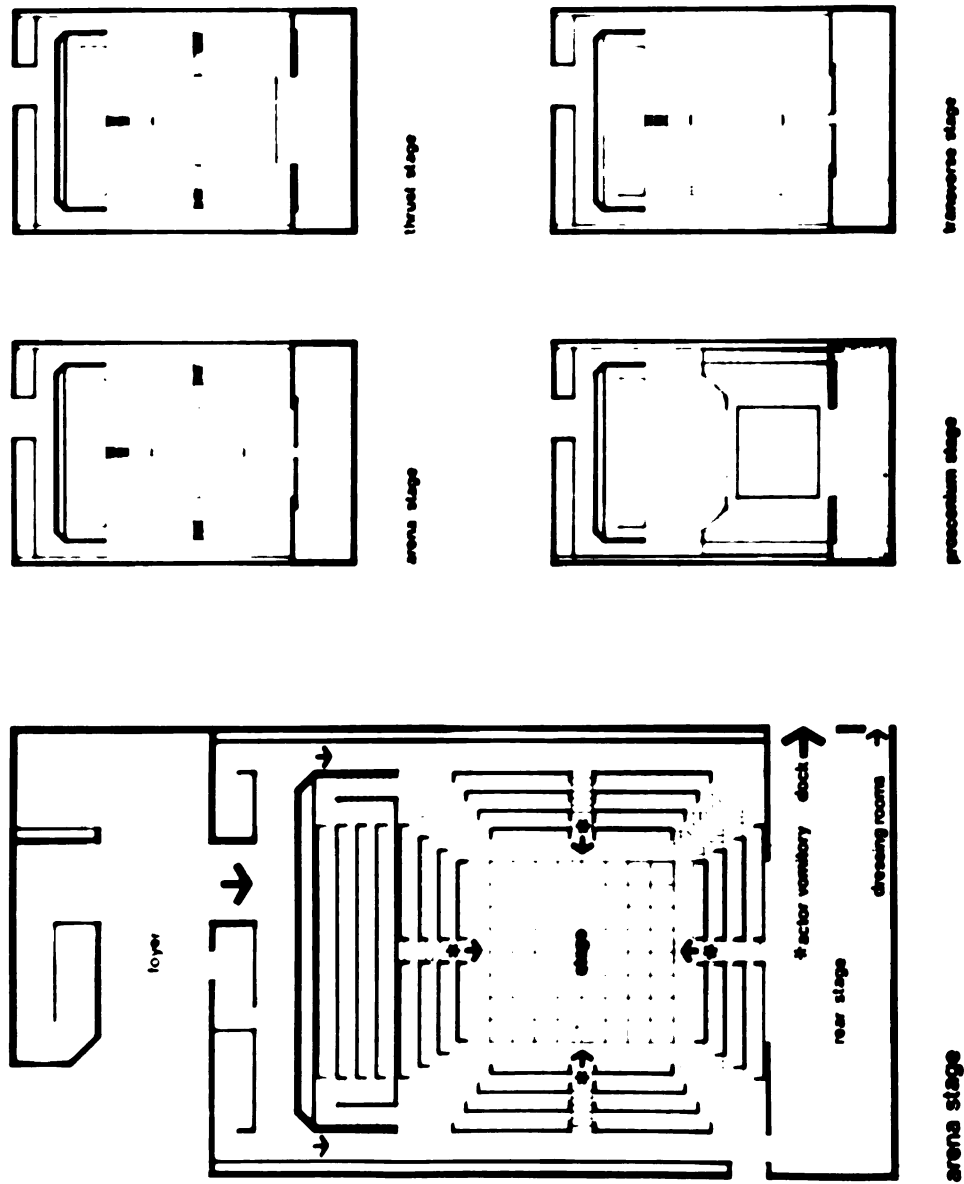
Floor Plan of the Upper Theatre (open stage)
